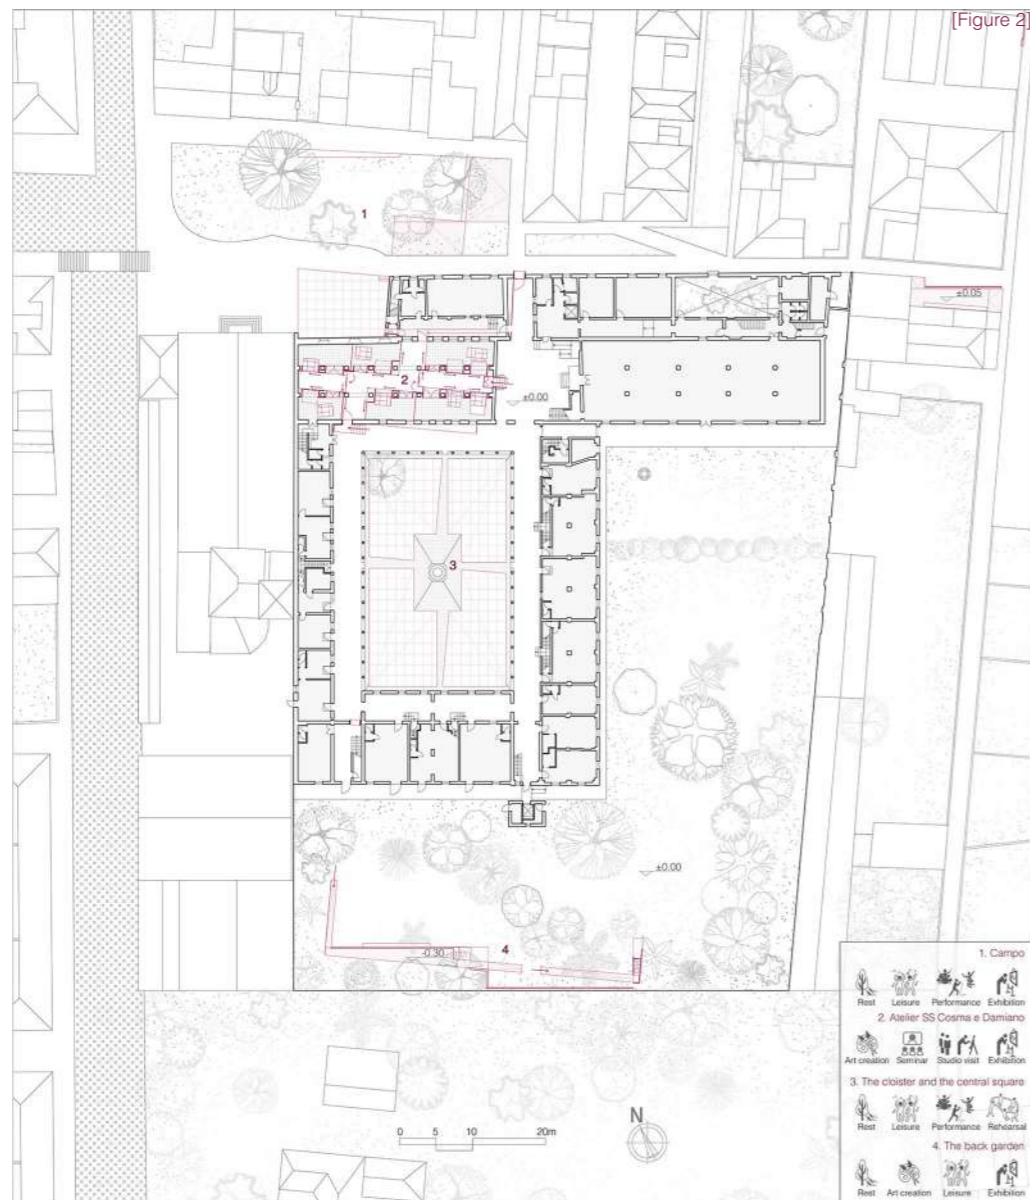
Ground floor plan of the convent after intervention – diagram by the author.
